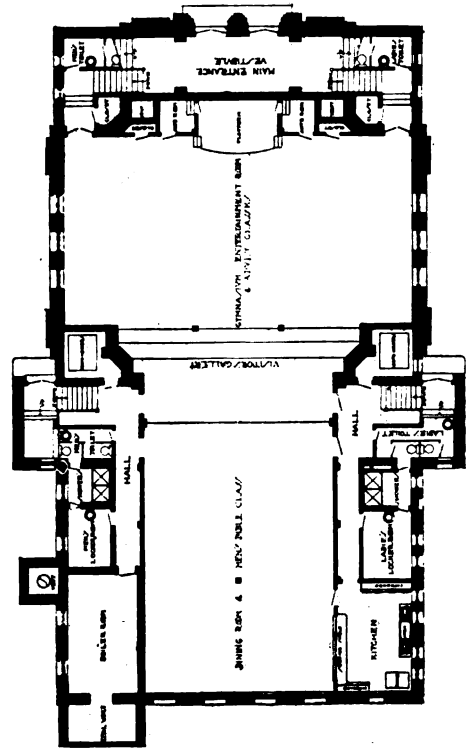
FIRST METHODIST CHURCH, CLINTON, IND.—BASEMENT PLAN.
